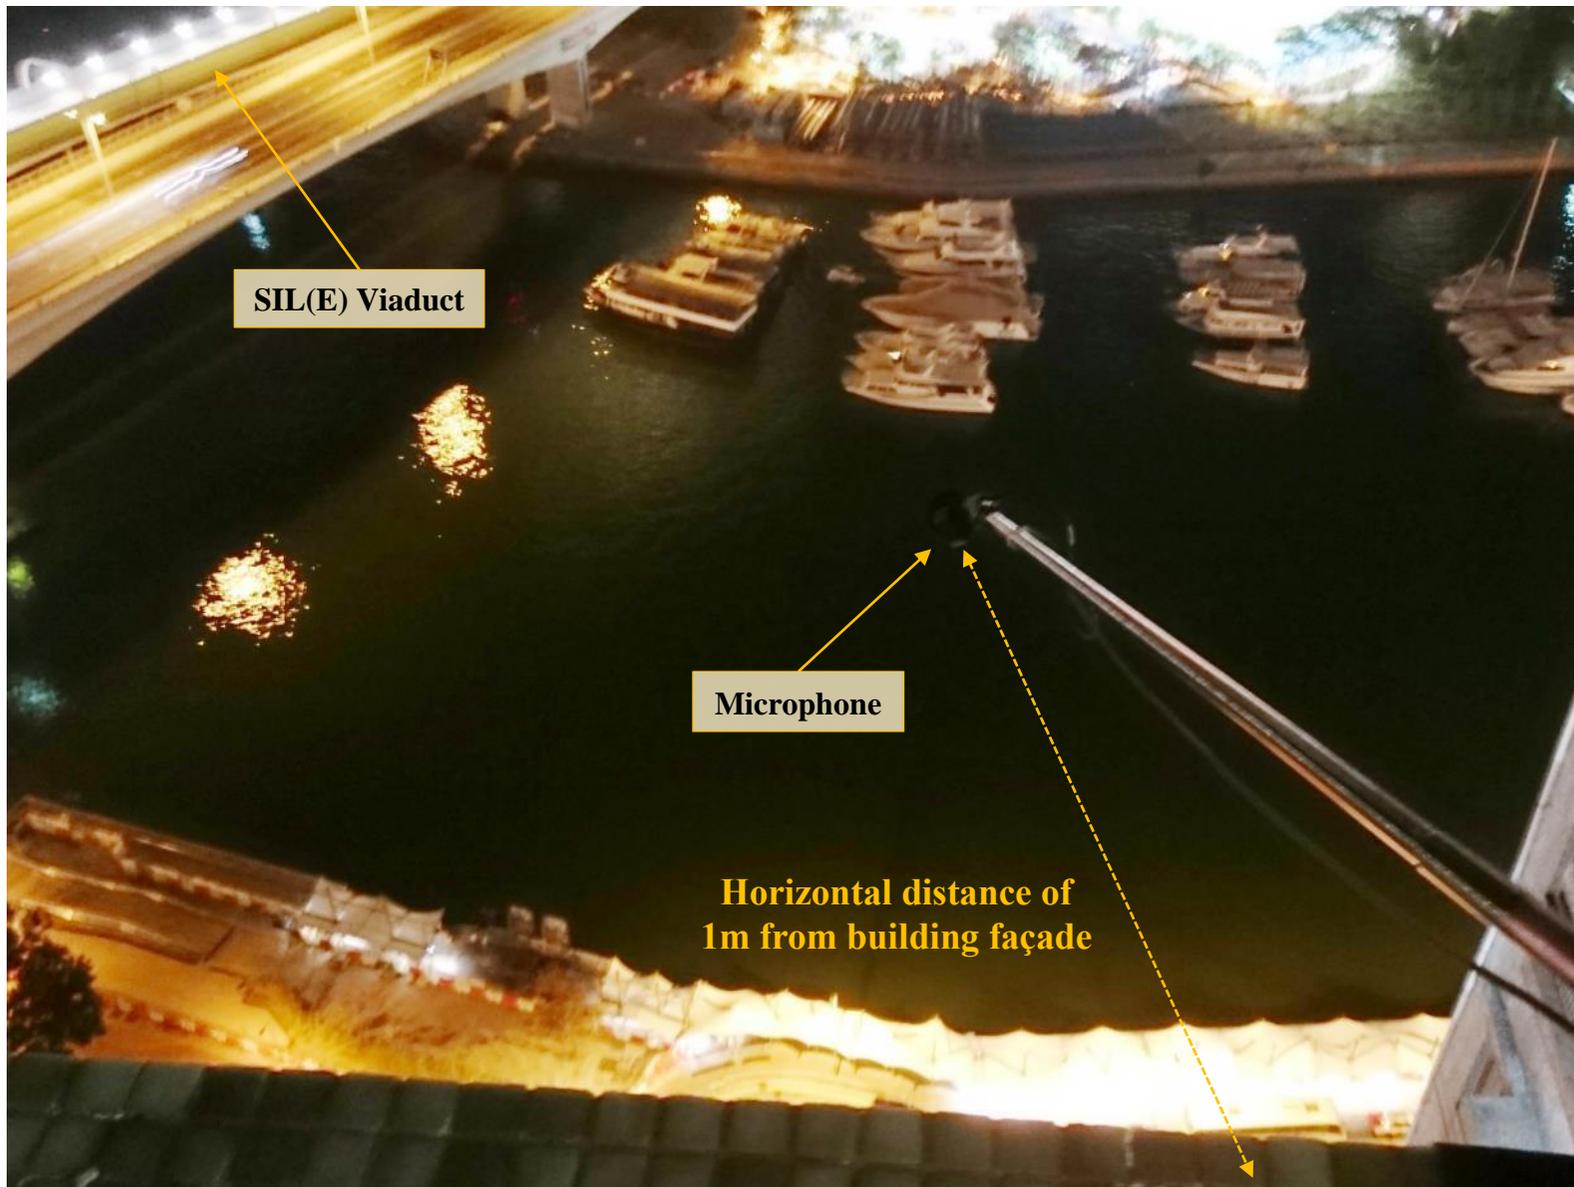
Measurement Setup at SWT3 (Sham Wan Towers Tower 3) at Refuge Floor (26R/F)
